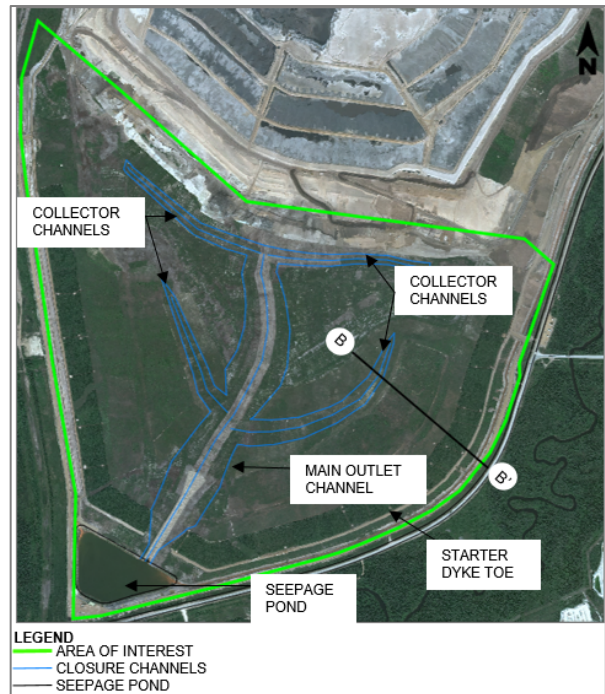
Plan View of an Out of Pit Terrestrial Closure Example
